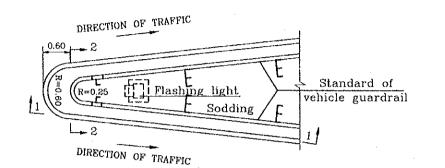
# DETAIL OF MEDIAN OPEN FOR DRAINAGE SCALE 1/25
